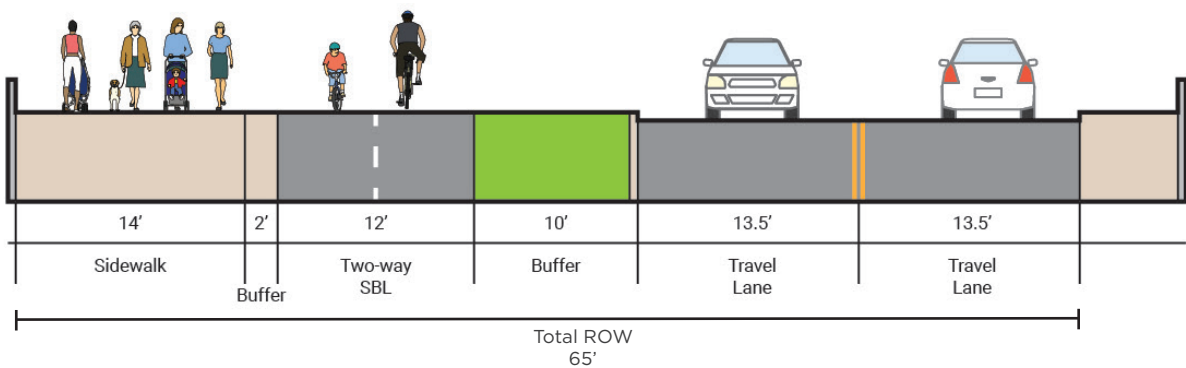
Clifton Boulevard Bridge Section - Long-term (looking eastbound)
